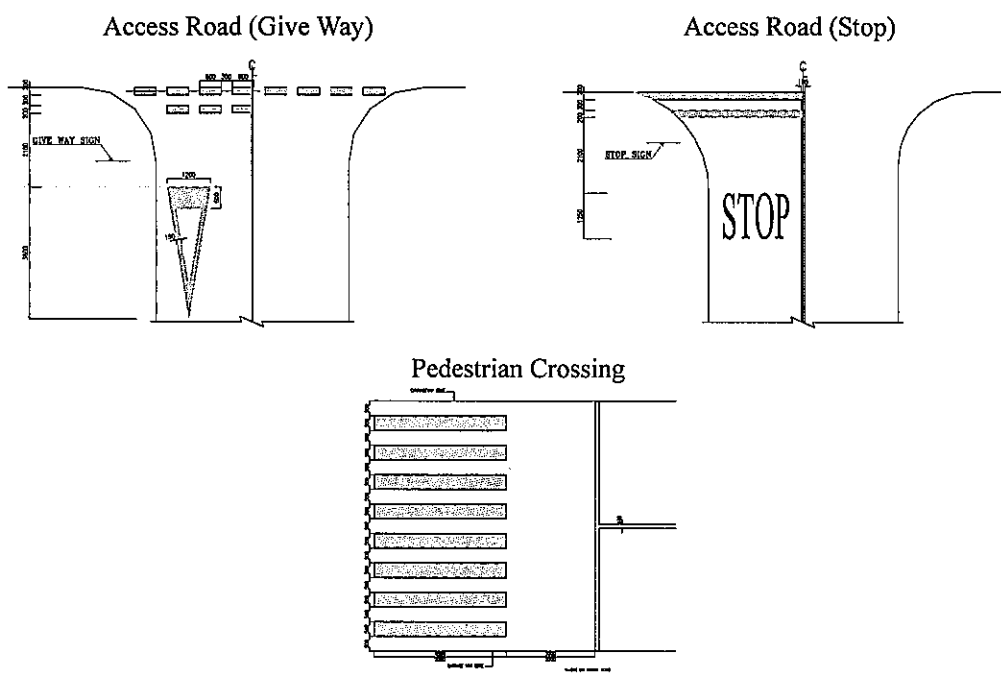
shows some of typical road markings to be provided for the target roads.
